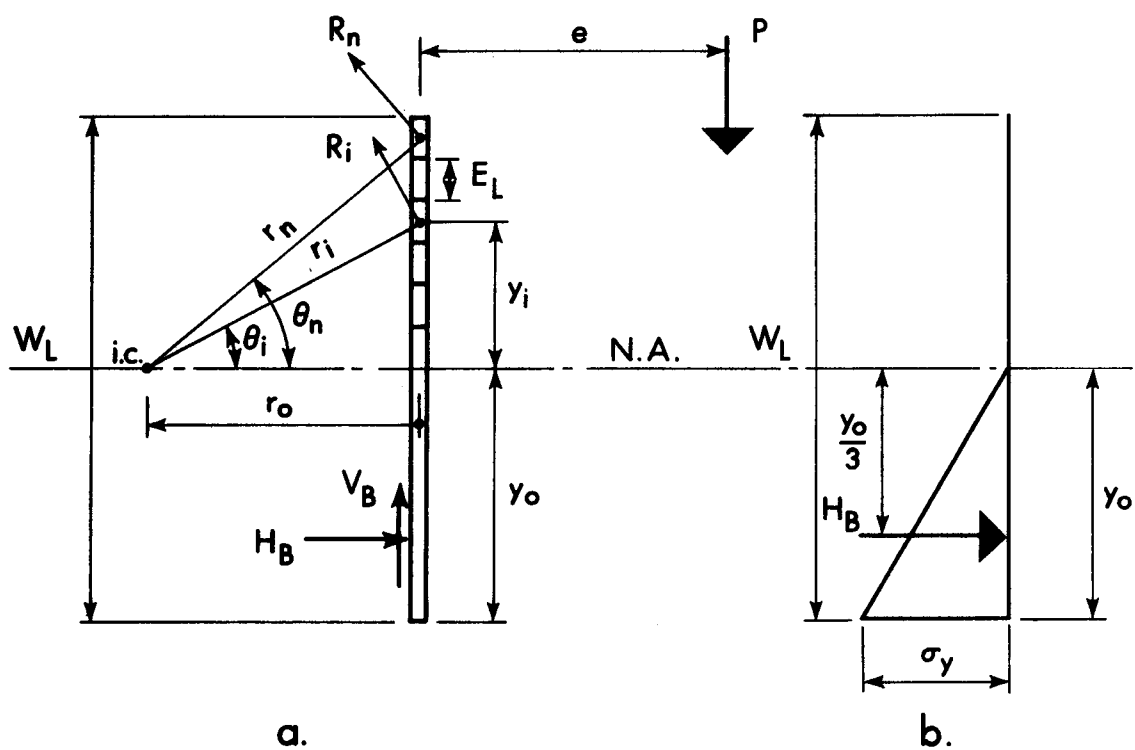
ECCENTRICALLY LOADED FILLET WELD
